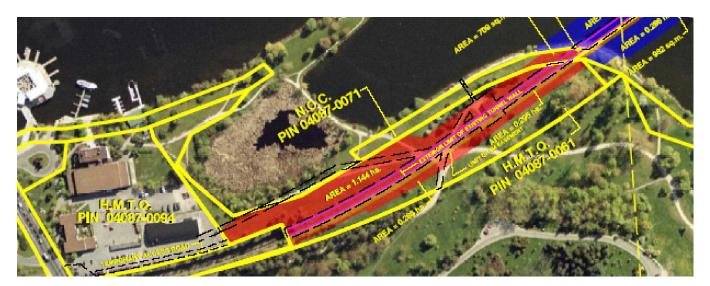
Potential Construction Staging Areas and Accesses
